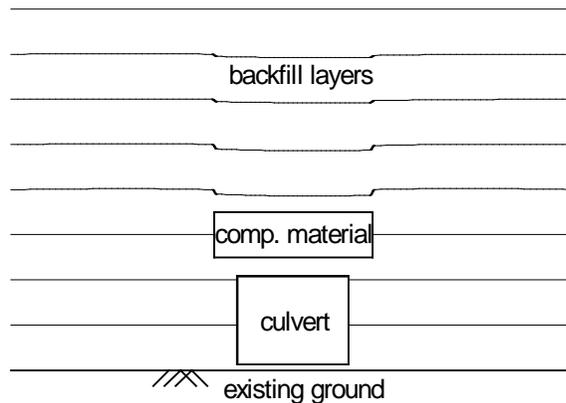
IMPERFECT TRENCH CULVERT
